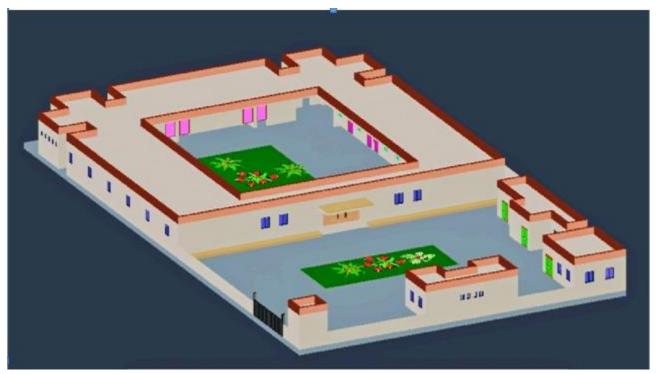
3D LAYOUTS OF COLLEGE BUILDING COLLEGE BUILDING SECTION
